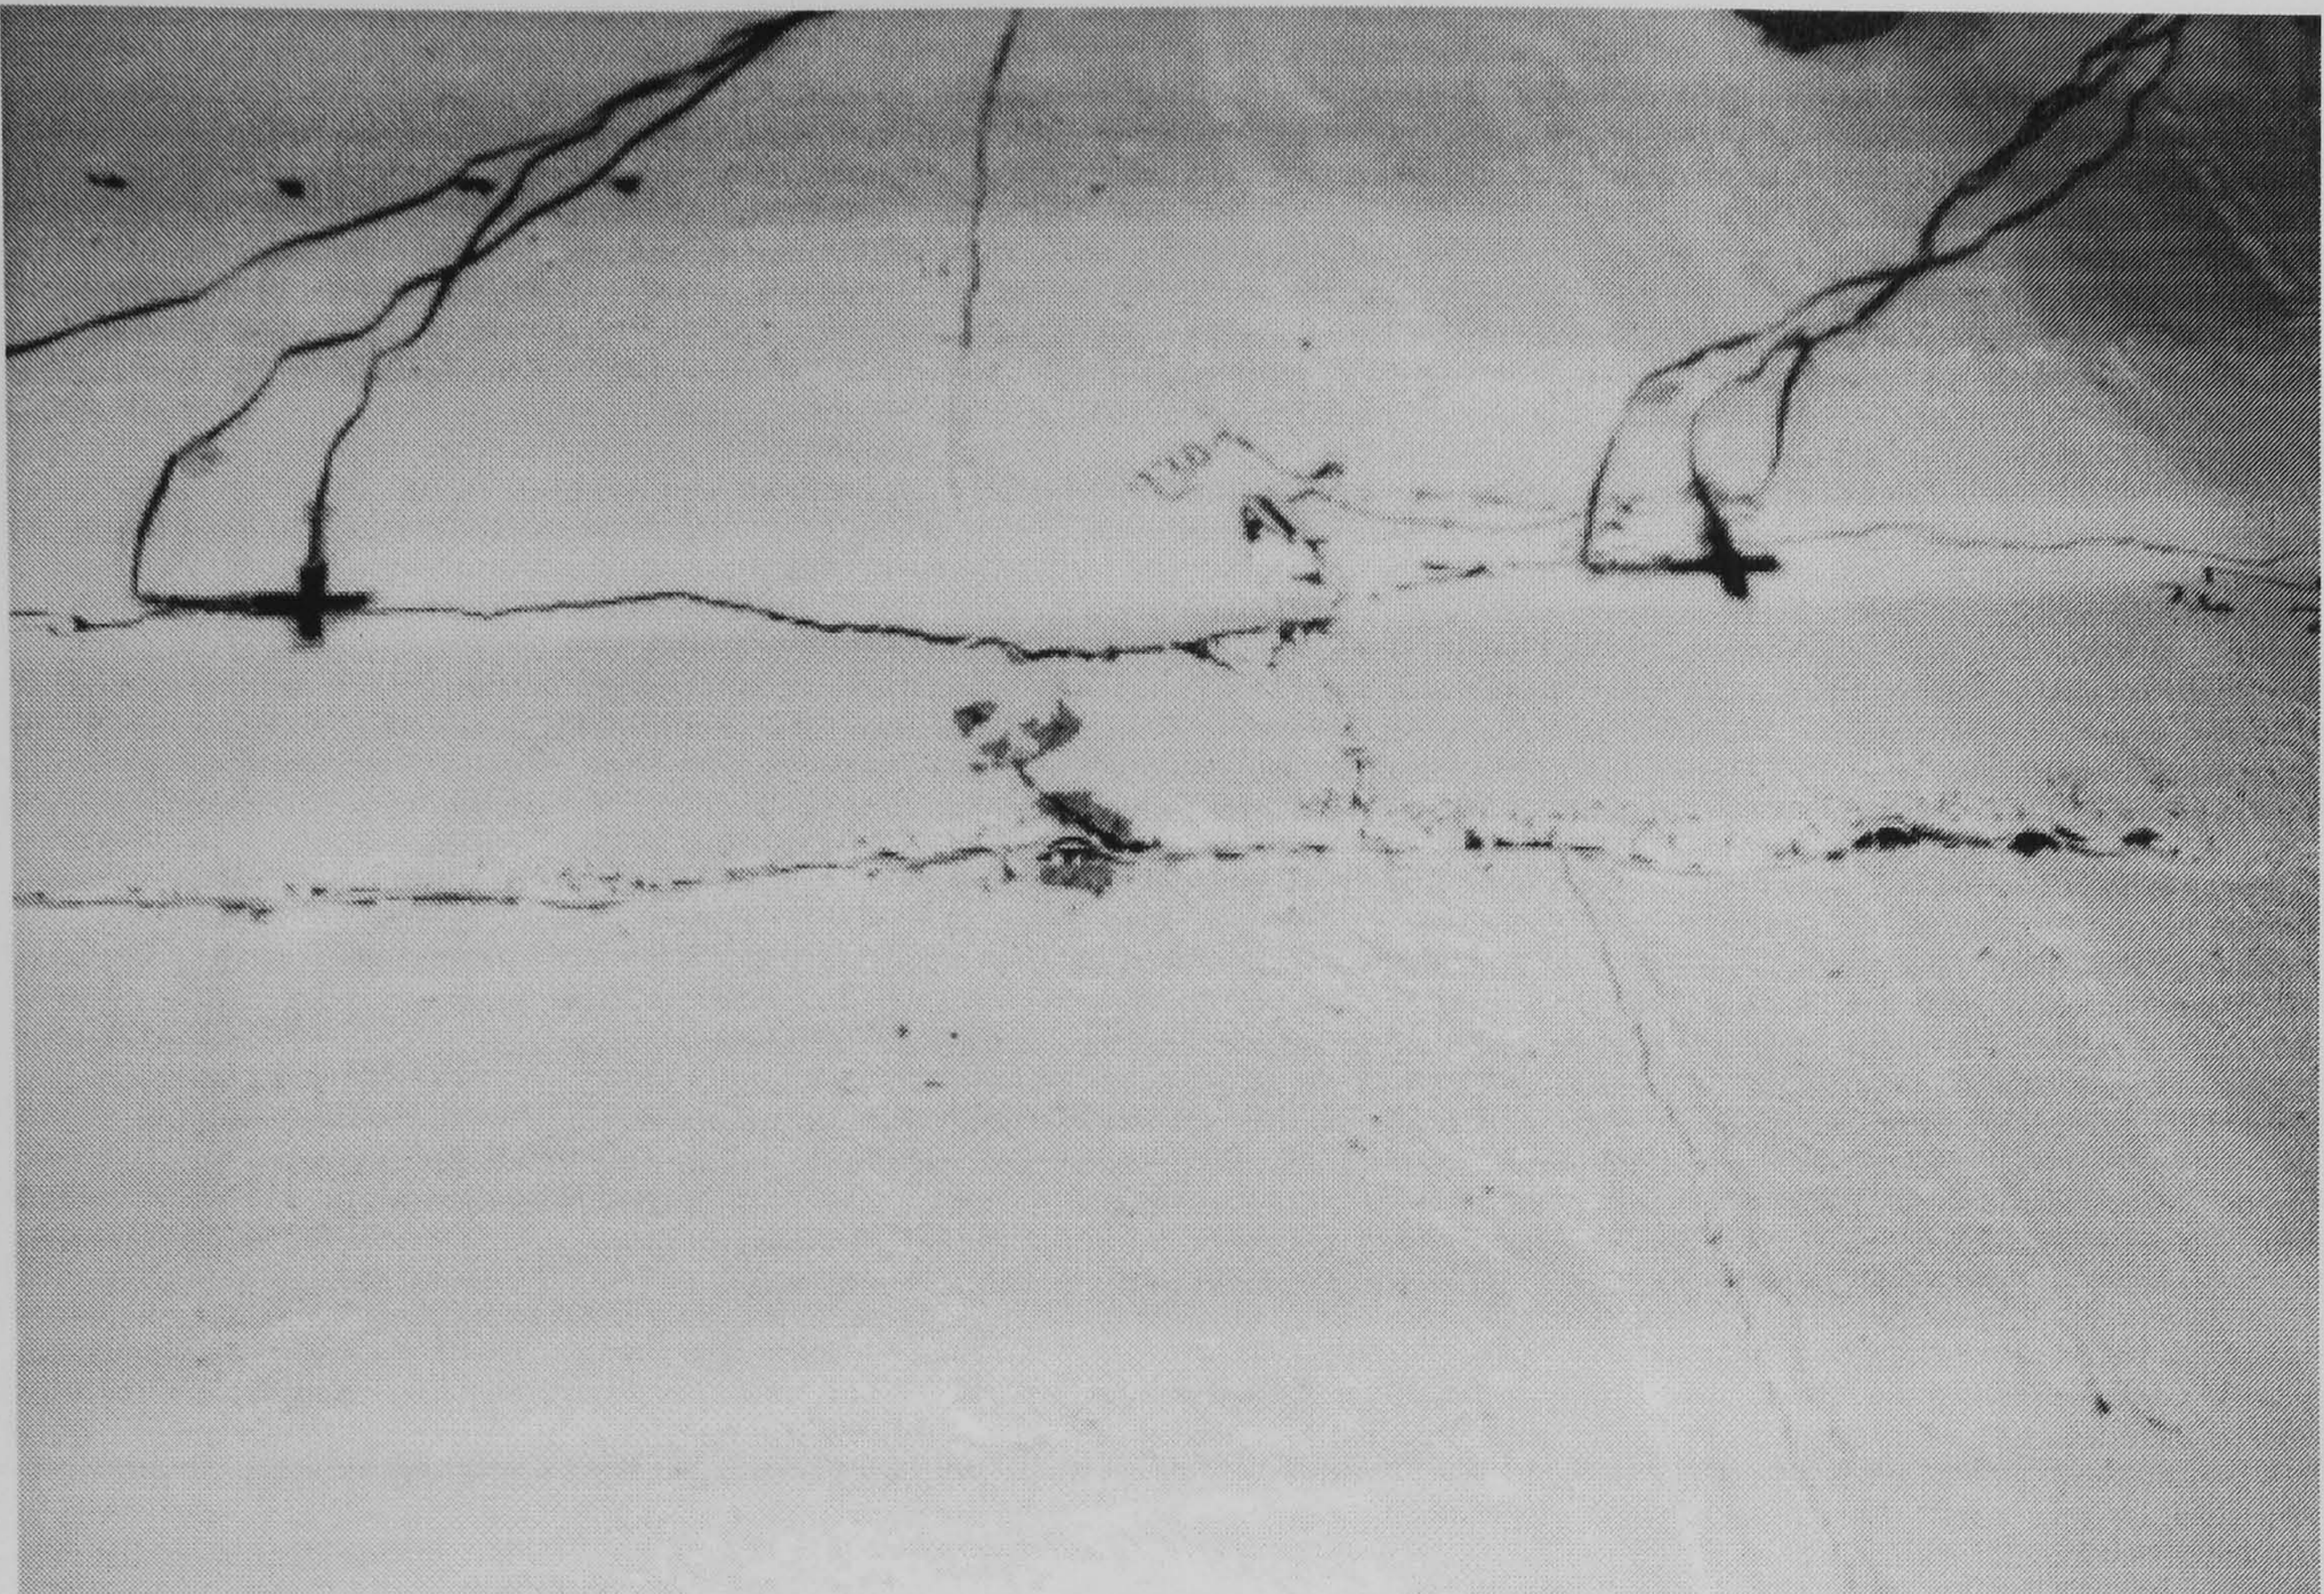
Cracks at transverse joint between hcu of Test CB3
